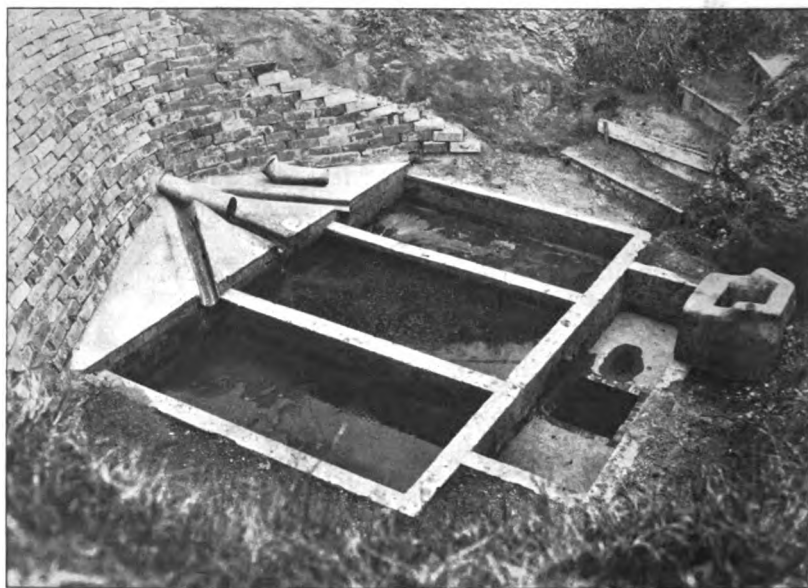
General view of sludge pits. By the use of a loose piece of tin piping, the sludge can be run into each pit in turn. The water, which drains off the top of the sludge, is bailed into the hopper shown on the right.
